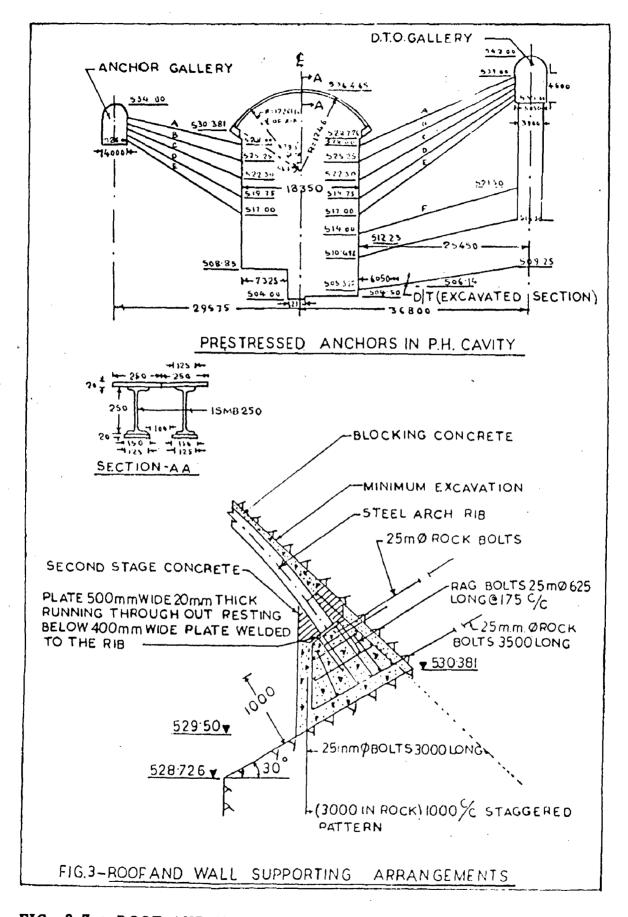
ROOF AND WALL SUPPORTS IN CHHIBRO POWER HOUSE
